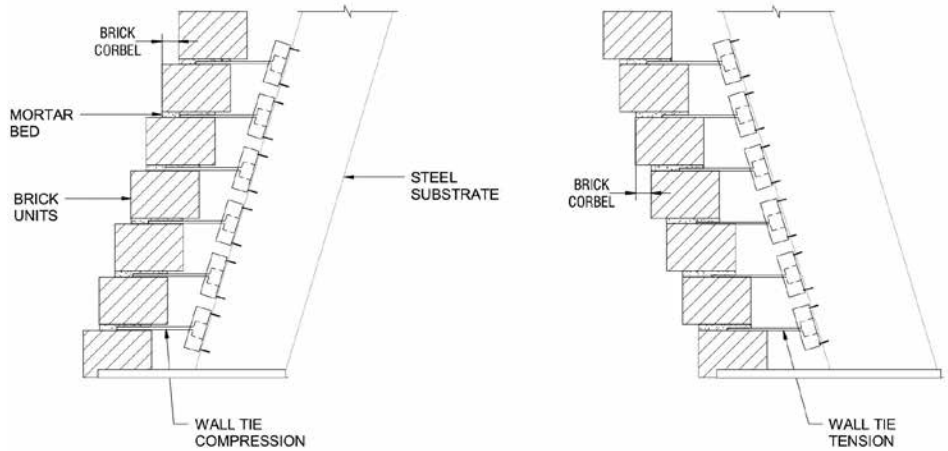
Brick ties in compression when the wall leans in (left) and ties in tension when the wall leans out (right).
